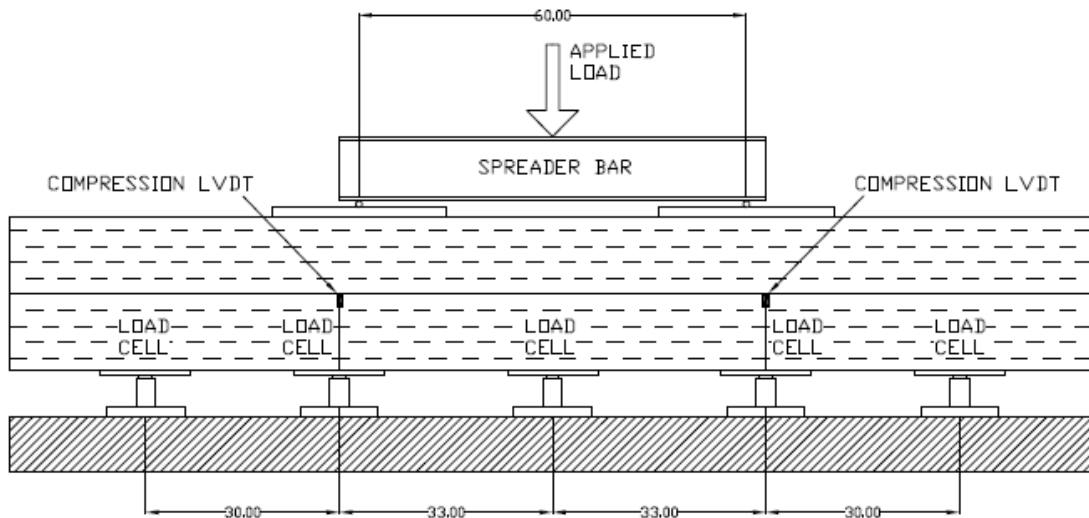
Test setup for Phase 2 tests. Drawing shows two stacked full scale beams. Dimensions in inches.
